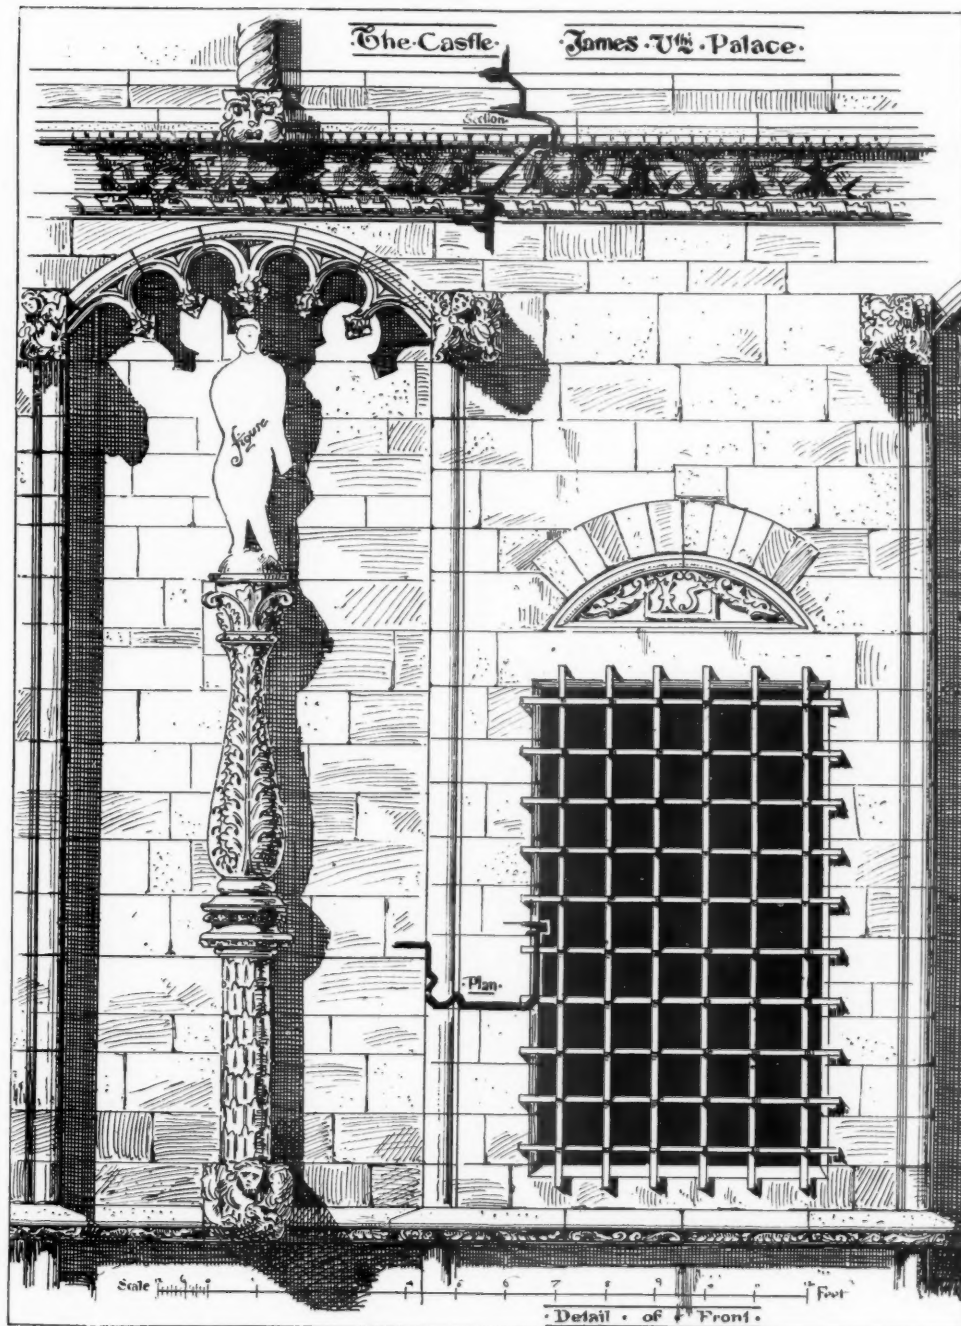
STIRLING CASTLE: ONE BAY OF ELEVATION OF PALACE TO UPPER COURTYARD.
